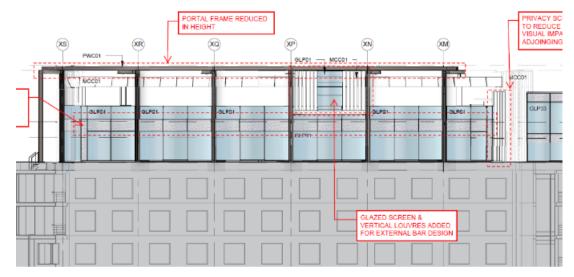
Proposed amended Western Elevation Source: Cox Architects
